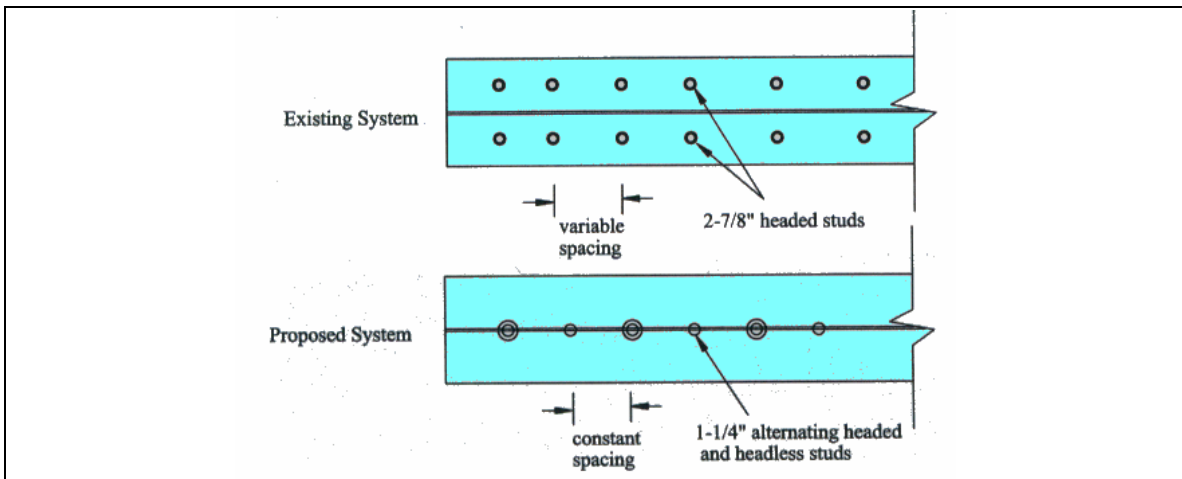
Top view of existing and proposed steel girder/deck connection systems (Tadros and Baishya, 1998)
